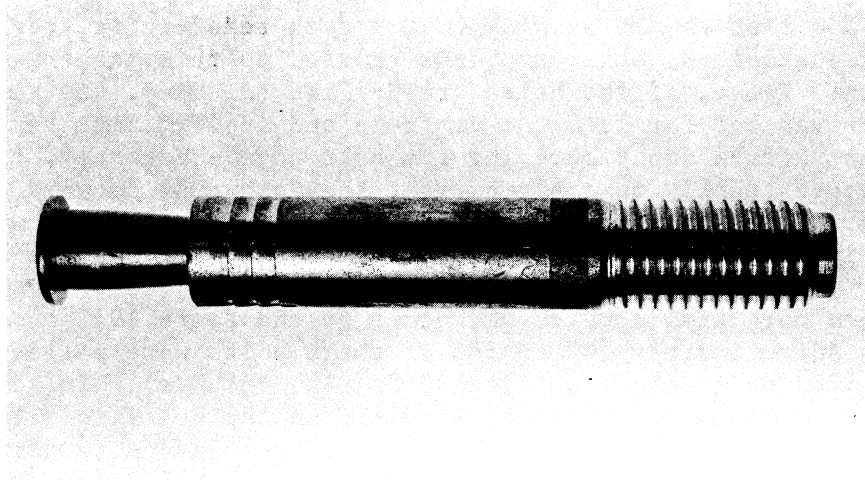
Typical anchor bolt used in the drilled holes on the SBL Route 95 connection over the WBL of Route 295.
